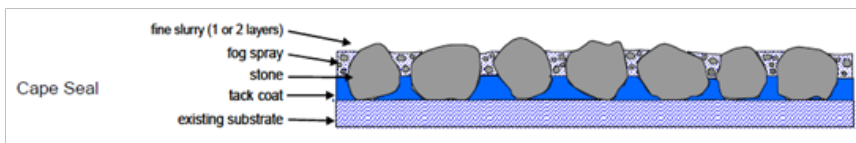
Cape type chip sealed road pavement cross-section (SANRAL 2007).
